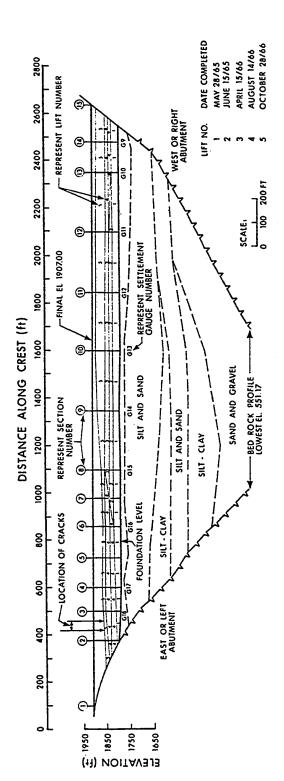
LONGITUDINAL SECTION OF DUNCAN DAM SHOWING CONSTRUCTION SEQUENCE AND LOCATION OF CRACKS
